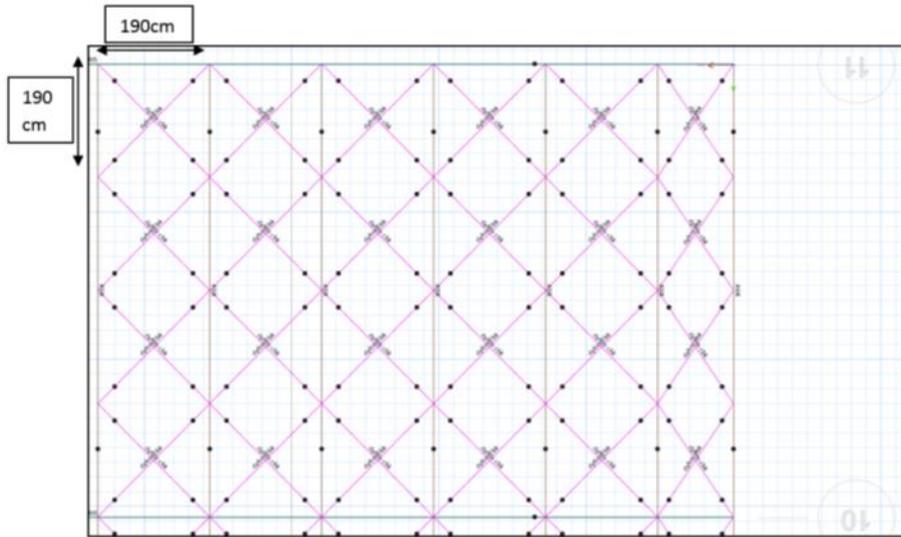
Roof Rigidity Modelling as per TBDY 2018 Attachment 8B
